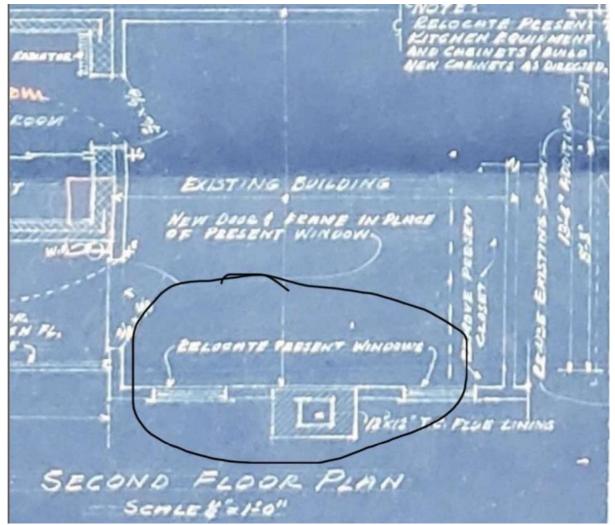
1951 drawings showing the relocation of the subject windows from the western exterior wall
